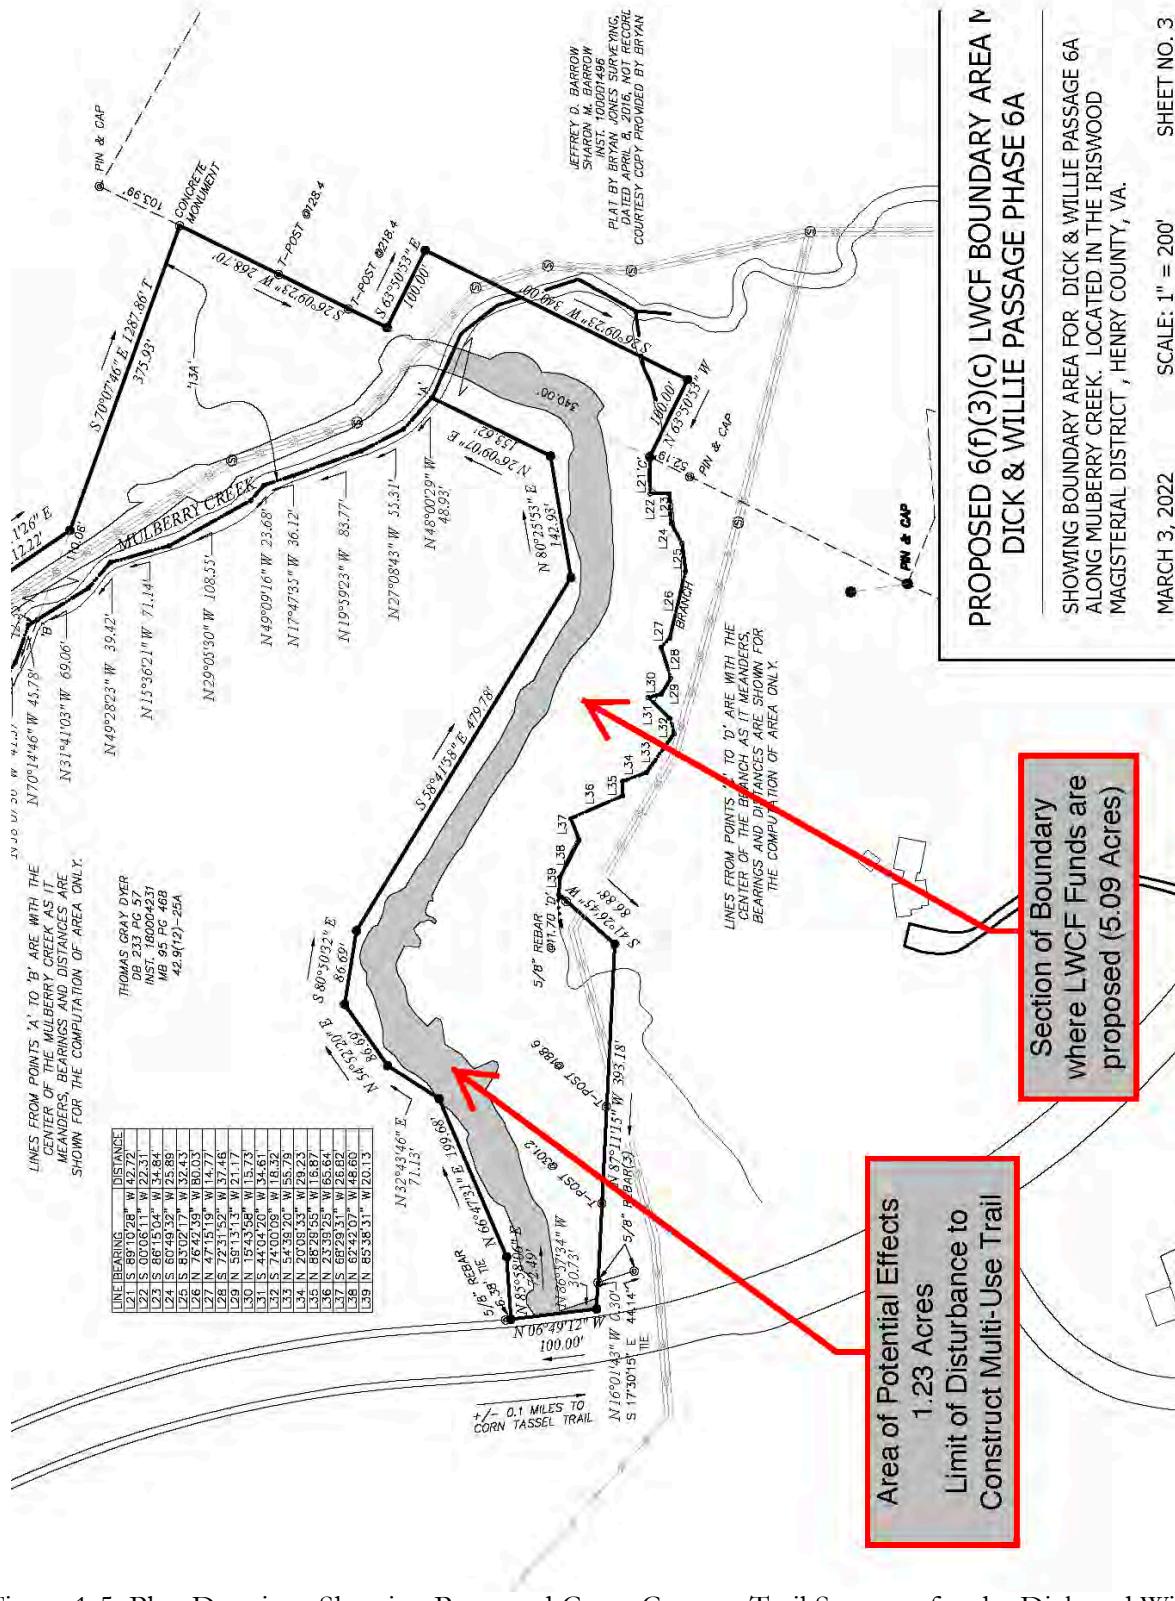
Plan Drawings Showing Proposed Cross-Country Trail Segment for the Dick and Willie Passage Phase 6A Trail Connector
